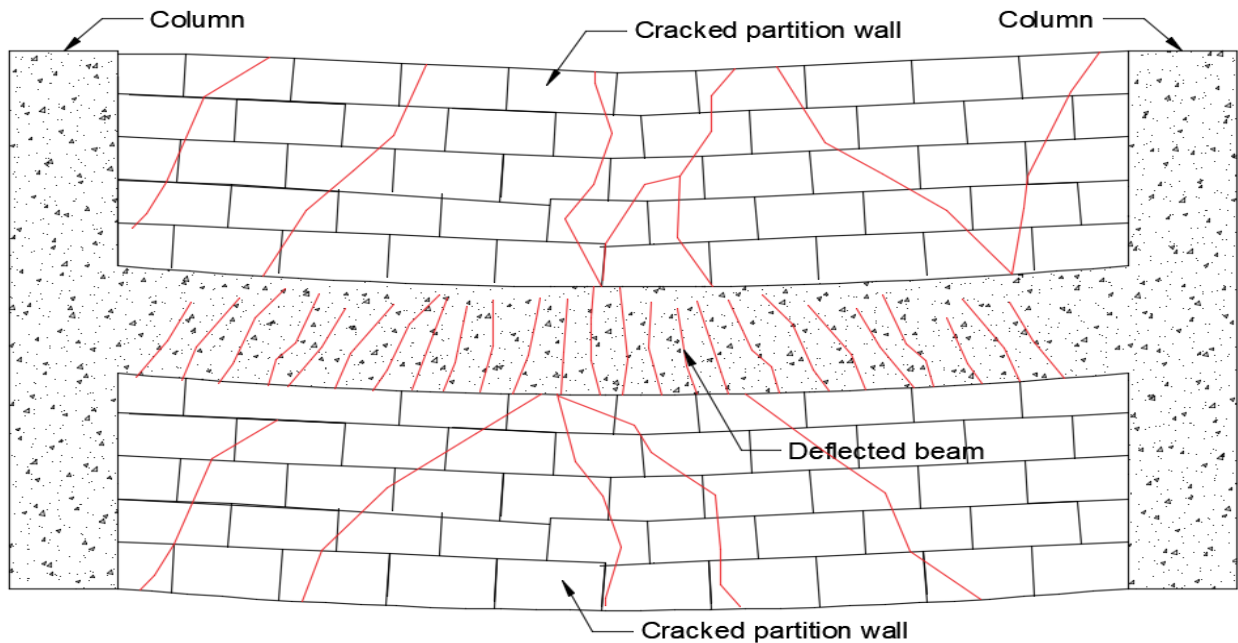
Partition wall cracking due to deflected beam
